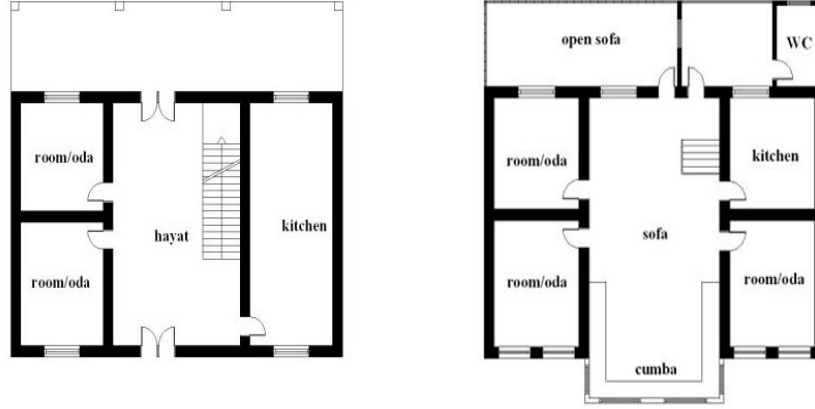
Ground and first floor plans of Şadiye Köken House. (Drawings by Author, 2011)
